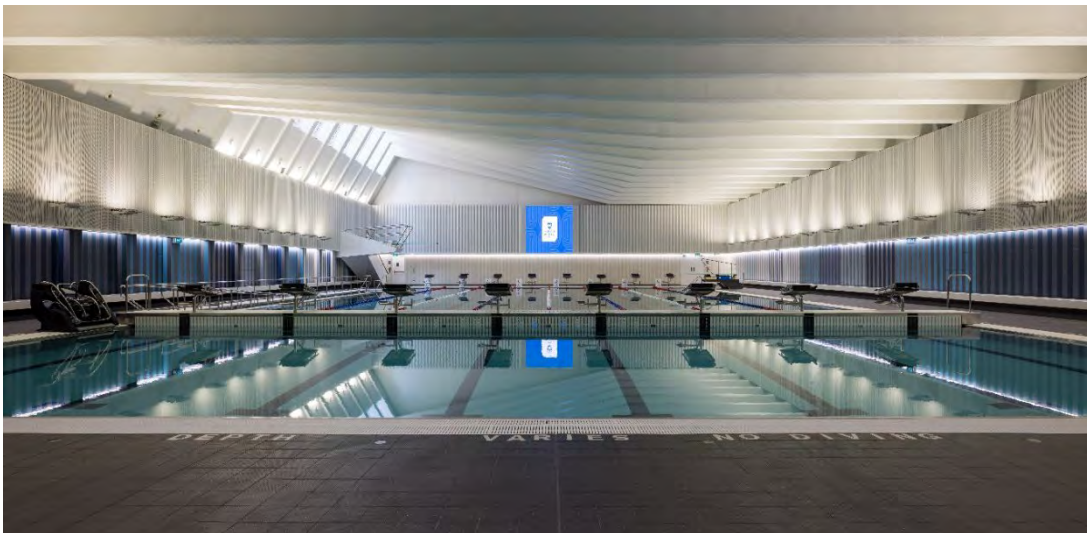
Pool roof box girders forming the profiled pool roof (Scowen, 2024)
